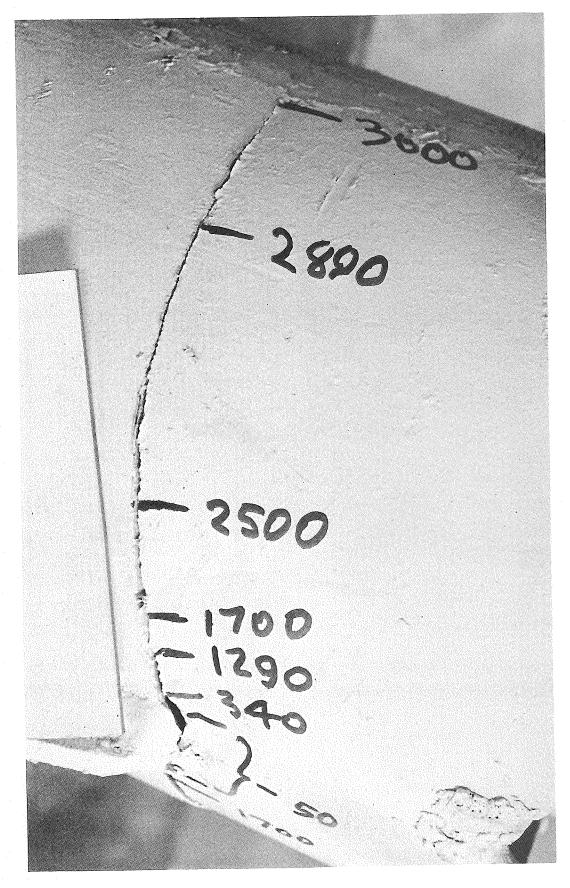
JOINT TYPE 3 - SPECIMEN No. 3 (TAPERED GUSSET PLATE) DETAILED CRACK PROPAGATION IN DIAGONAL MEMBER
